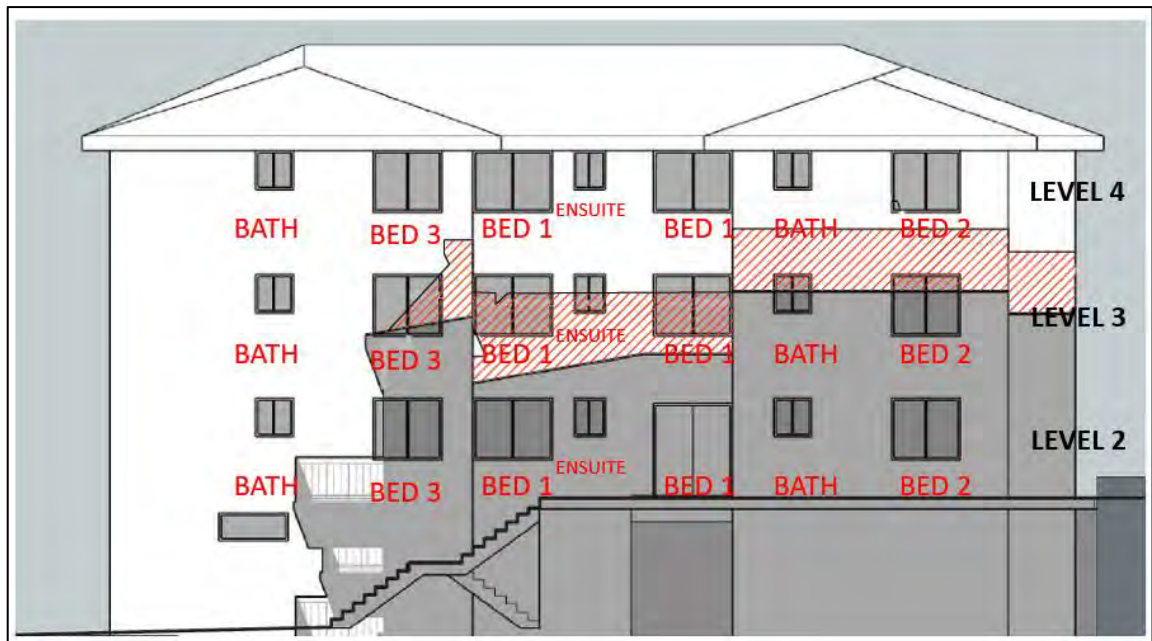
Elevational shadow diagram of 37-39 Sir Thomas Mitchell Road at 2PM during mid-winter as confirmed by floor plan issued by Consent No. 36/1974.
